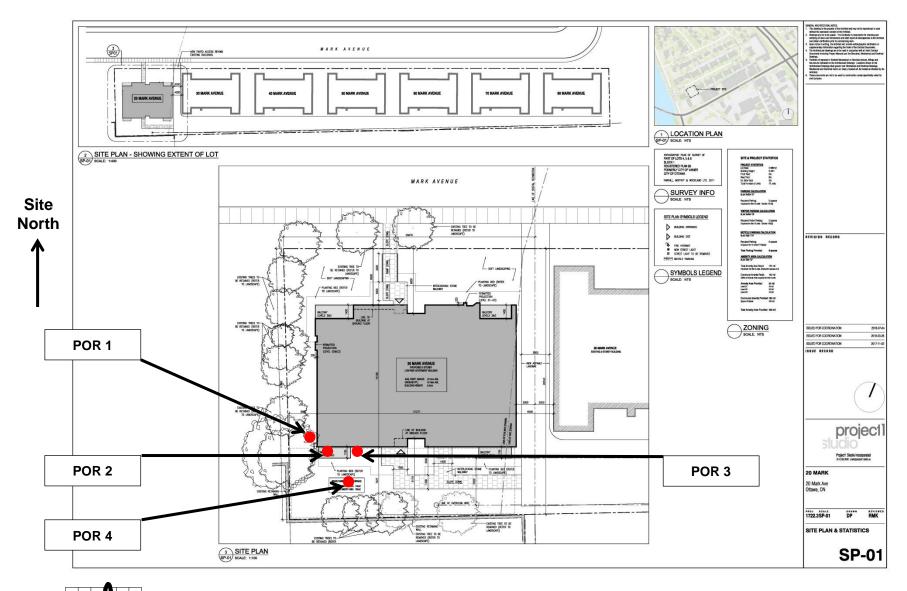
Ground Floor Plan showing Internal Living Areas and Outdoor Point of Reception (source: Project1 Studio Incorporated)
